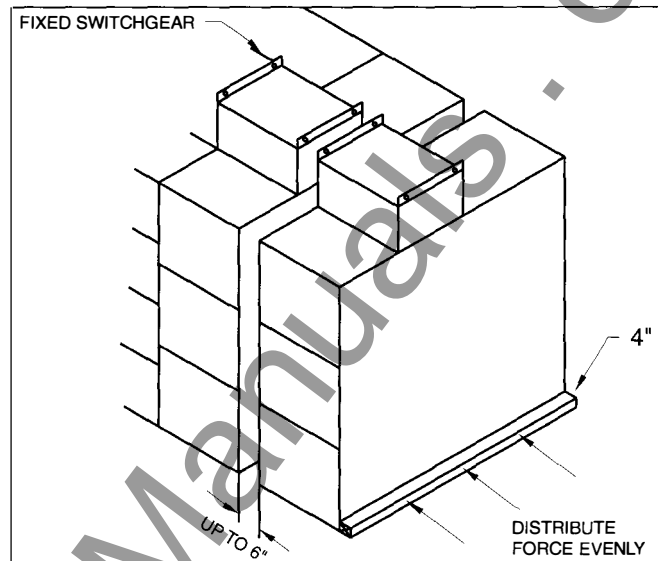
Final Positioning of Switchgear in Obstructed Areas without a Crane
